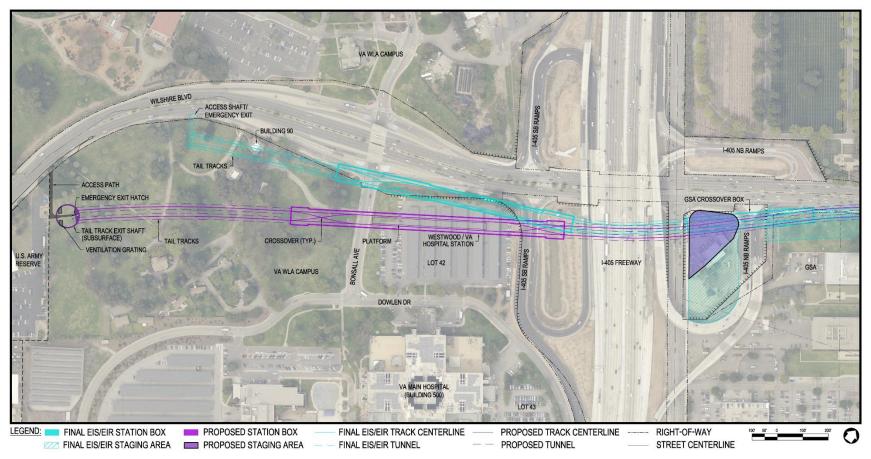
Tunnel and Crossover Alignment at the VA Medical Center – Final EIS/EIR and Proposed
